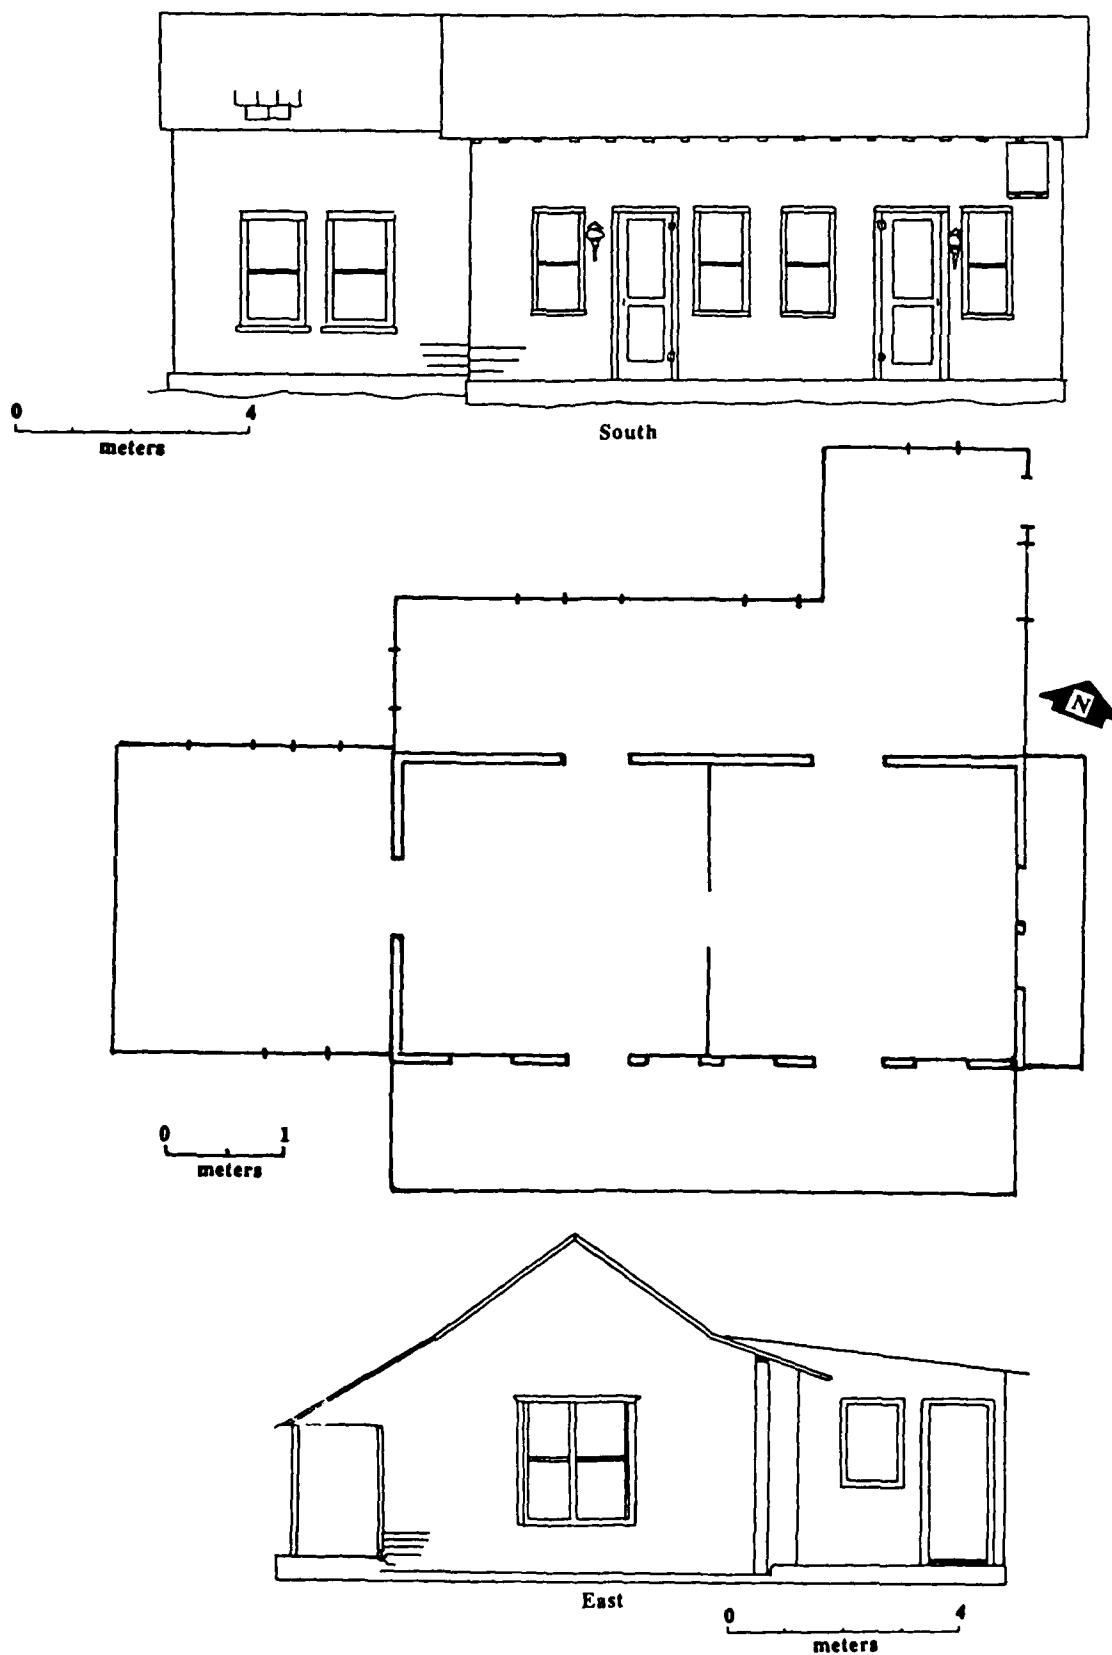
Floor plan and elevations of the Loyd dwelling, a double pen built of sawn oak lumber with mortise and tenon joinery.
